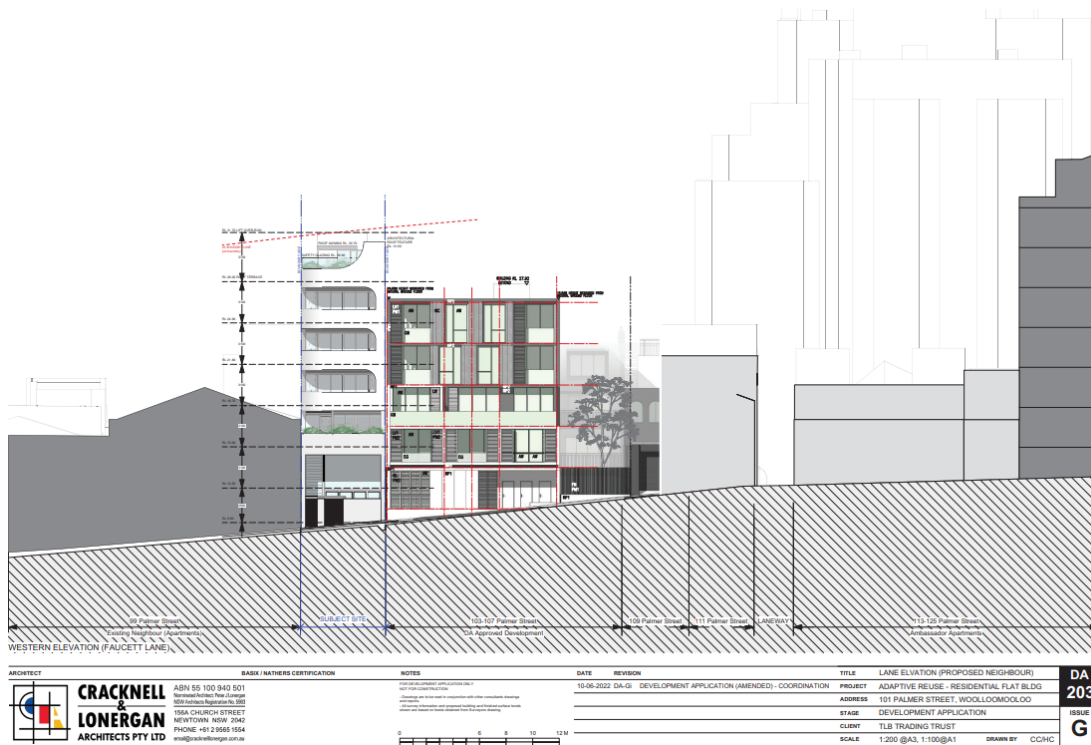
Proposed west Faucett Ln context elevation (NSW LEC approval shown adjacent)
